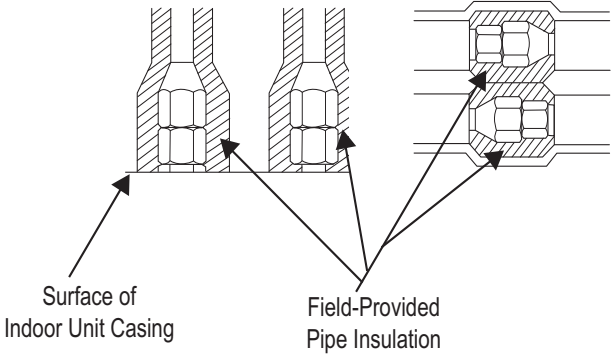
Typical Insulation Butt-Joint at Indoor Unit Casing.
